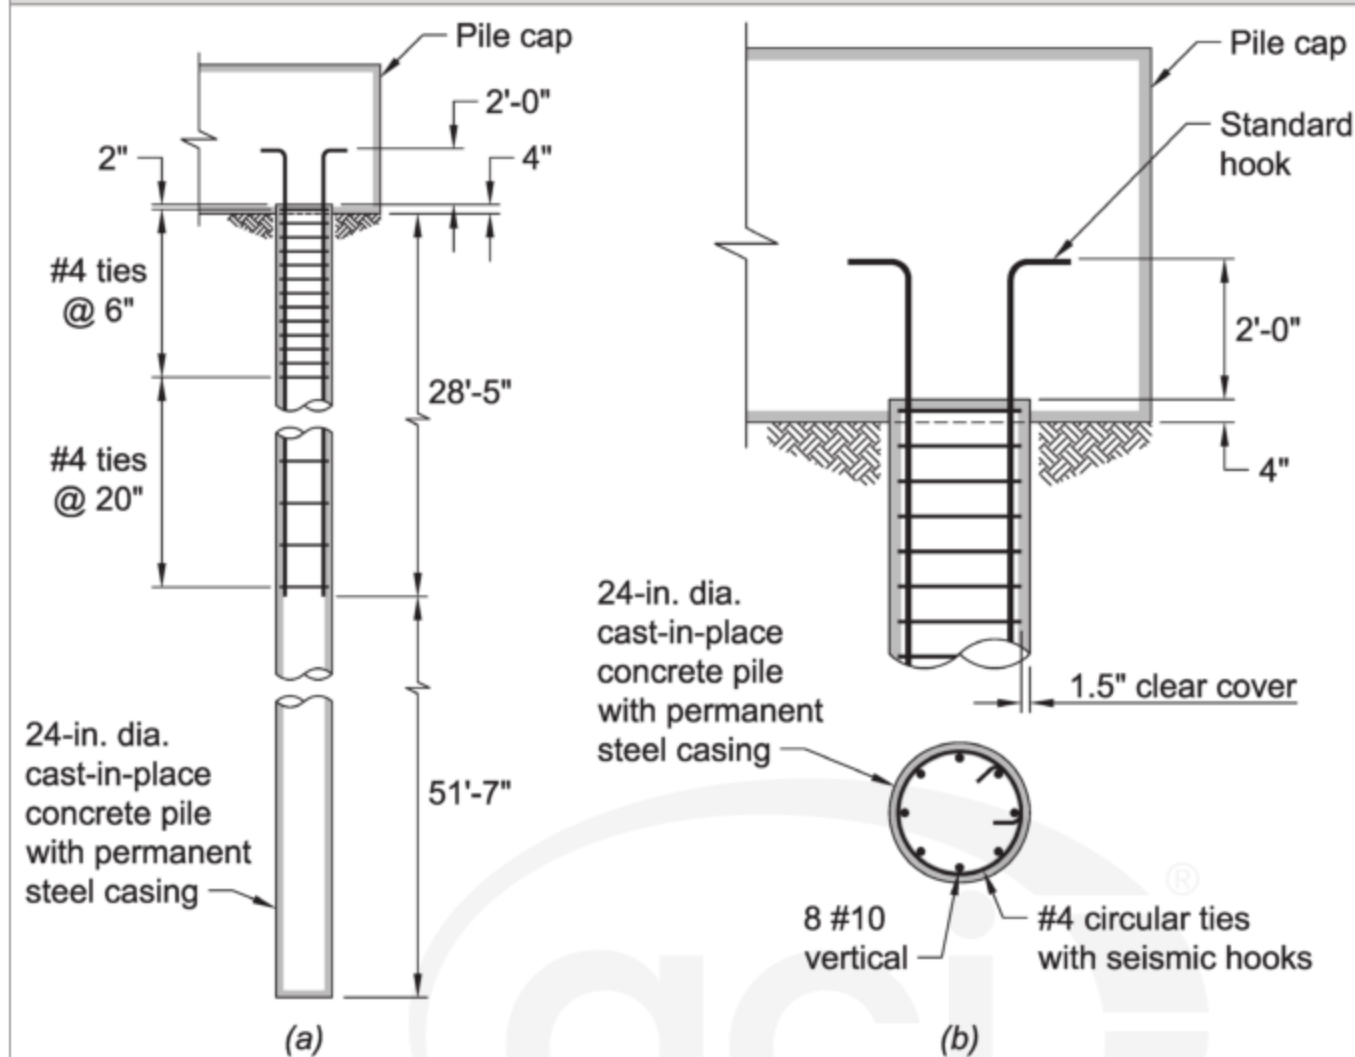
Pile design details including (a) pile elevation and (b) pile reinforcing details.
